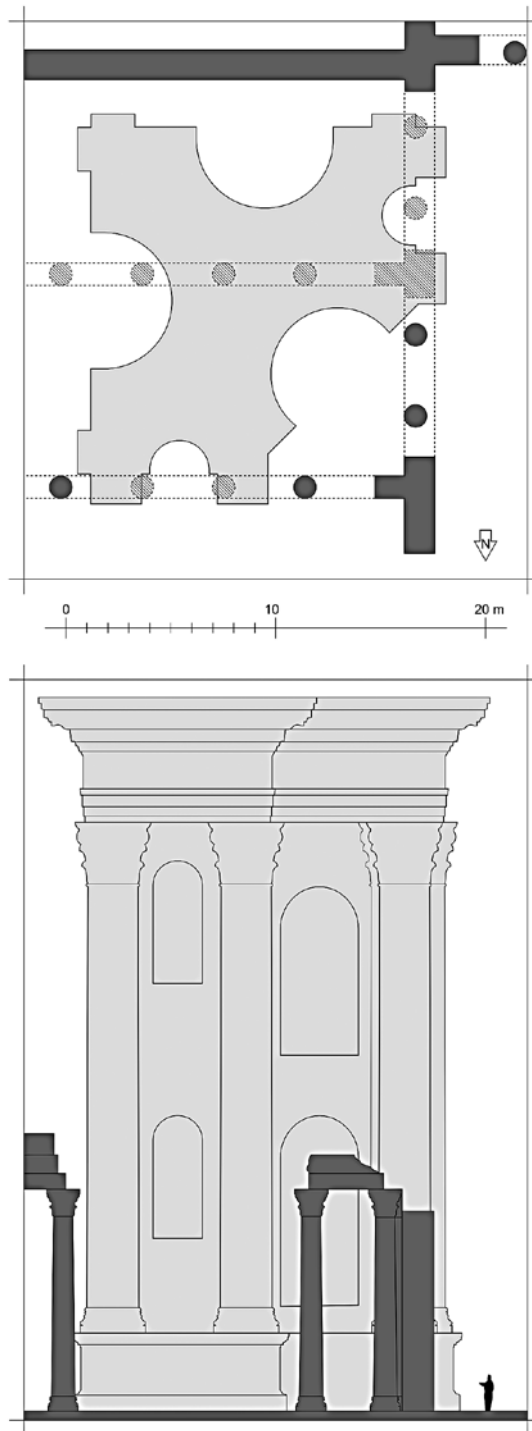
Plan and elevation by the authors of the southeast pier of the crossing of St Peter's Basilica, as depicted in the c. 1535 drawing (Fig. 10)
